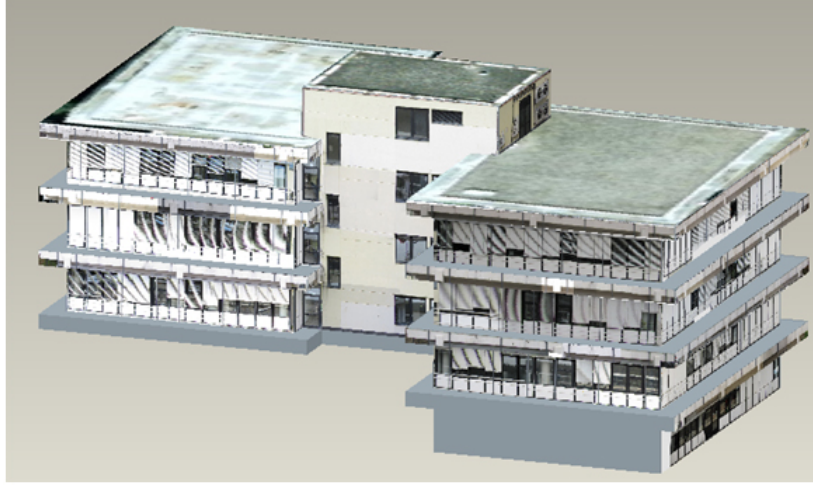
3D CAD model of inspected building (Fraunhofer IZFP)
